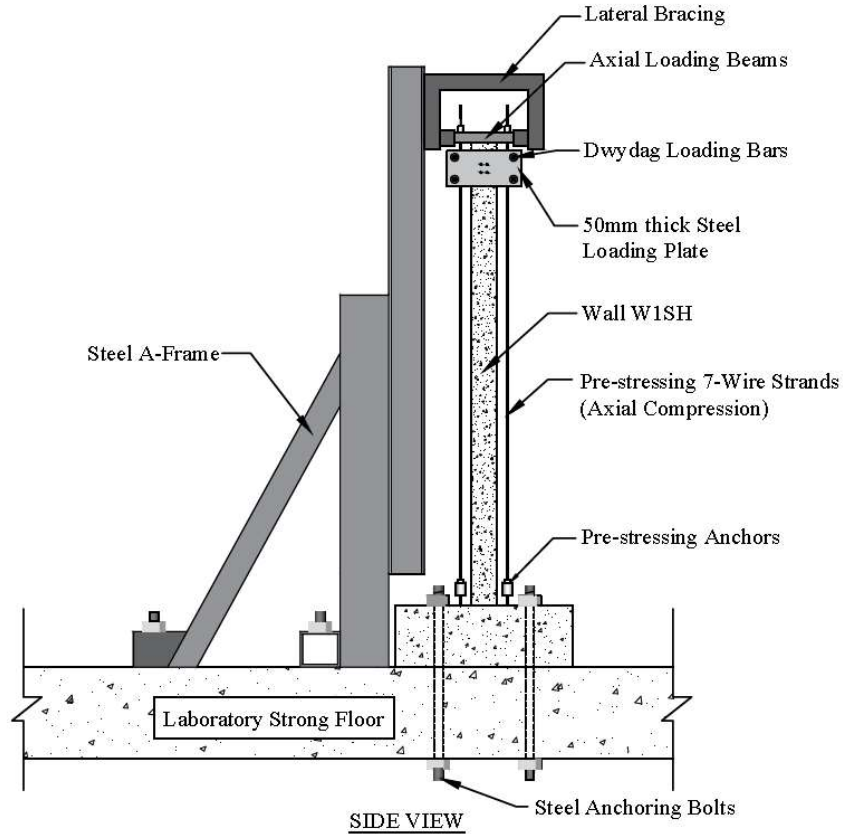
Proposed loading setup for Wall W1HS – side view
